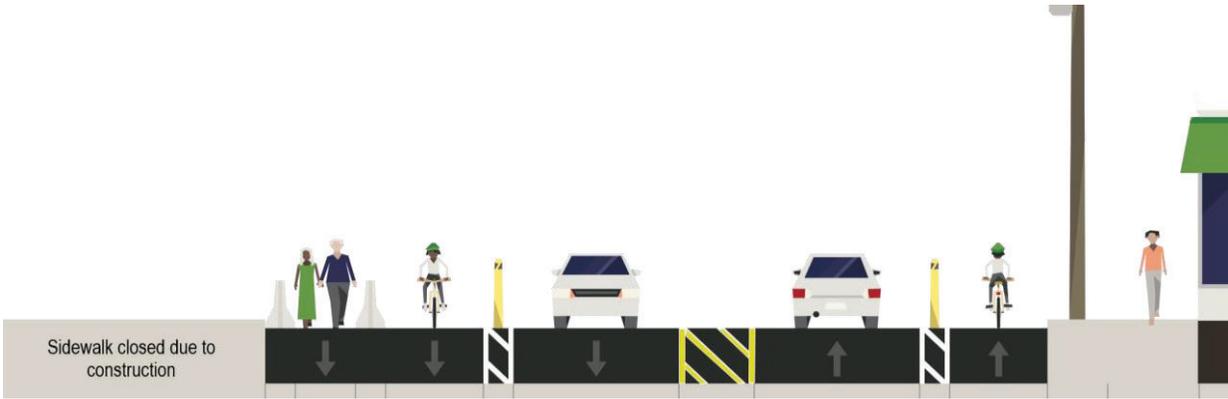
Proposed Cross Section of Evans Avenue between Rankin and Quint Streets, looking west
